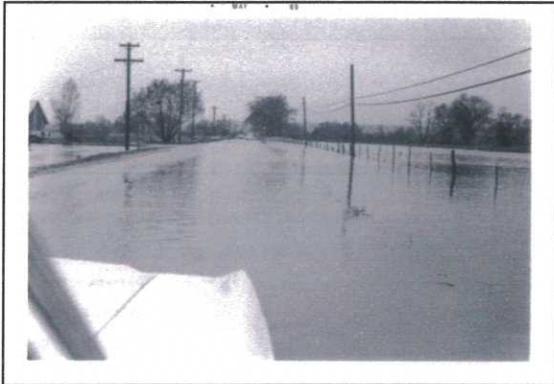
South Boulder Road Overtopping at Dry Creek No. 2 Ditch During 1969 Flood
